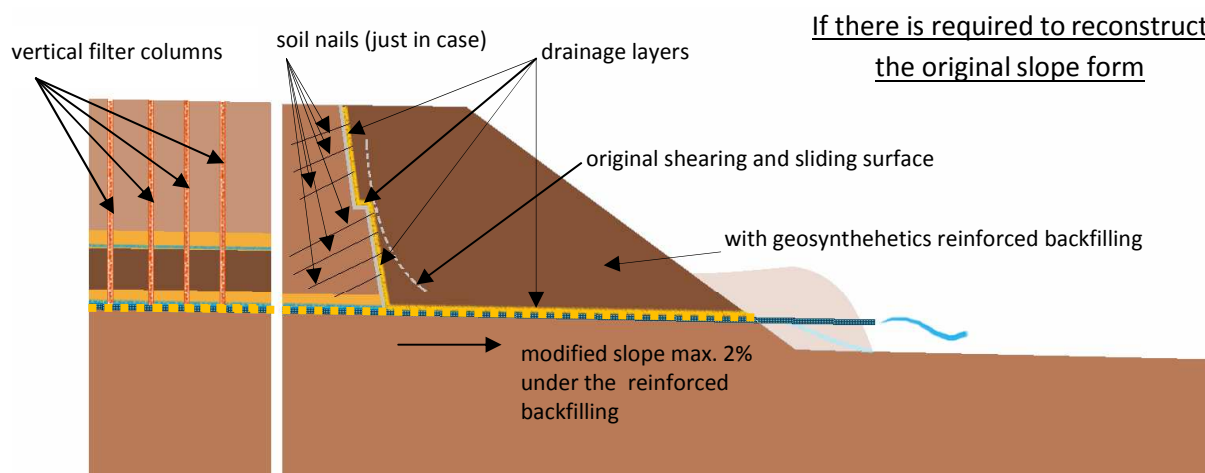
Sketch of an embankment cross section showing the complete reconstruction in original embankment form
